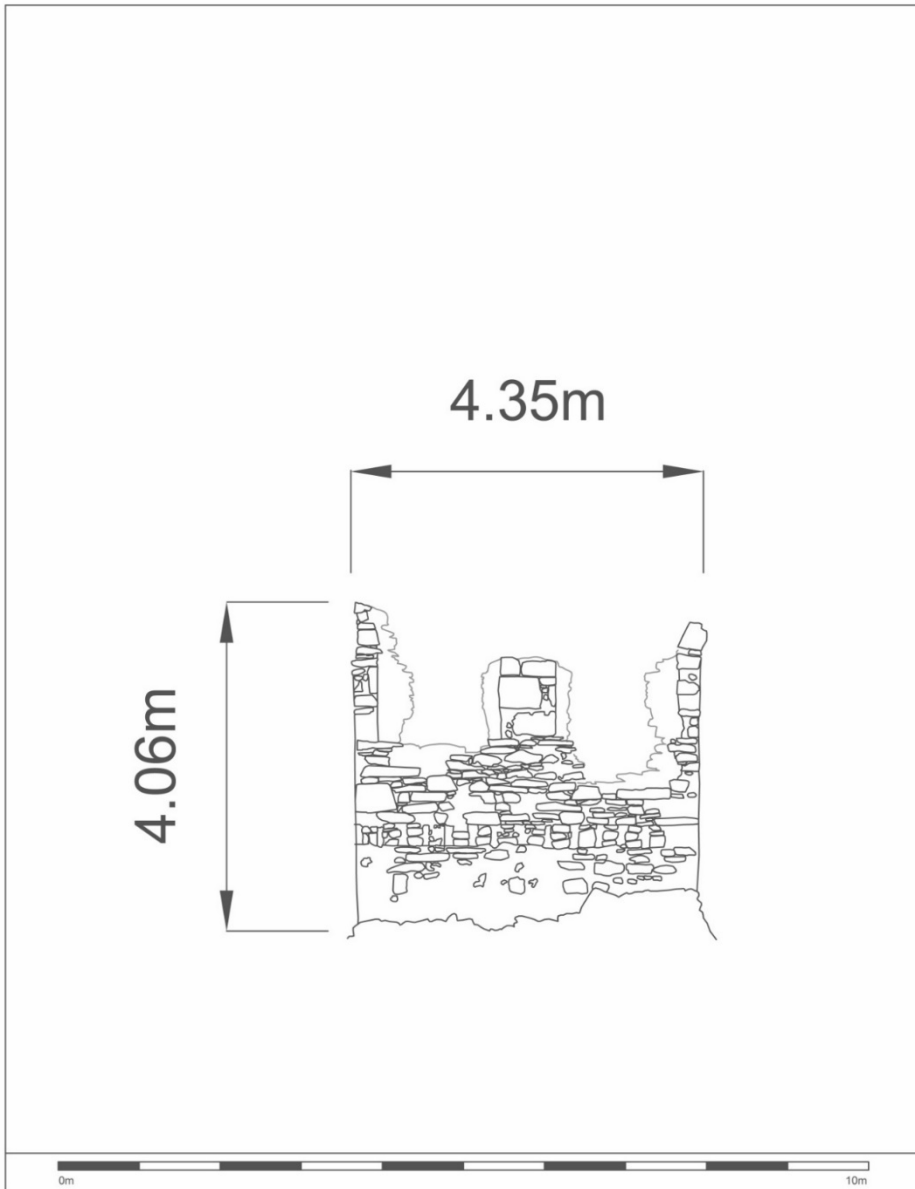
Internal elevation of the south wall of Saddle Hill Signal Tower.
